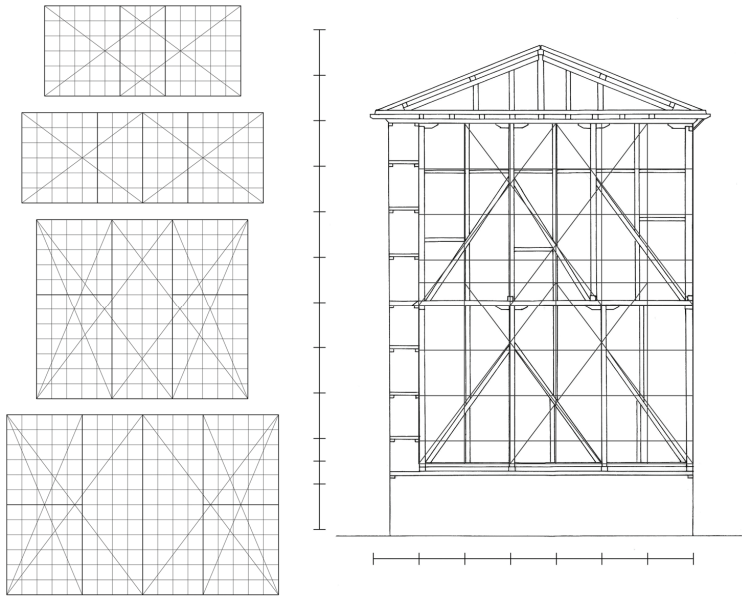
Use of the module and basic triangles 3-4-5, 6-8-10, 9-12-15 and 5-12-13 in the tracing of the basic model plans and in the construction of the timber-frame structure
